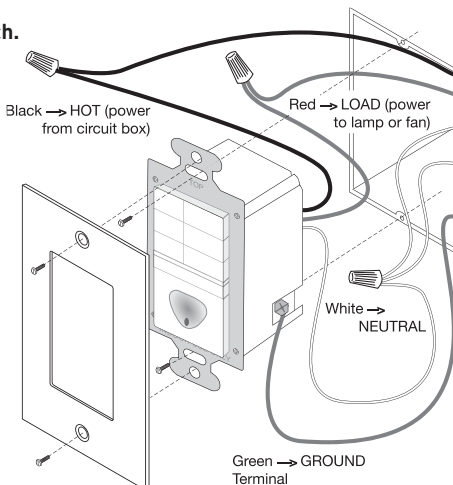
Switch Orientation, Wire Connections and Wall Box Assembly
